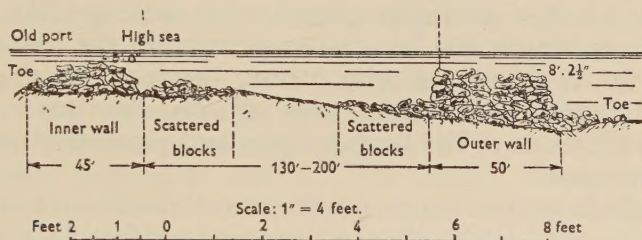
TYPICAL SECTION OF GREAT BREAKWATER,
